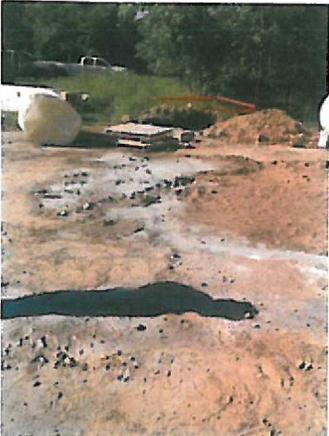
Cement washout is to occur ONLY in a cement washout pit, containing a plastic liner.
